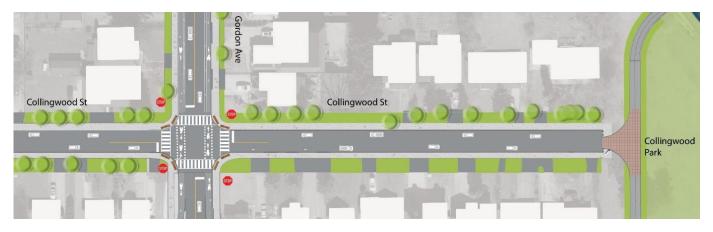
Recommended Cross-section of Collingwood Street
